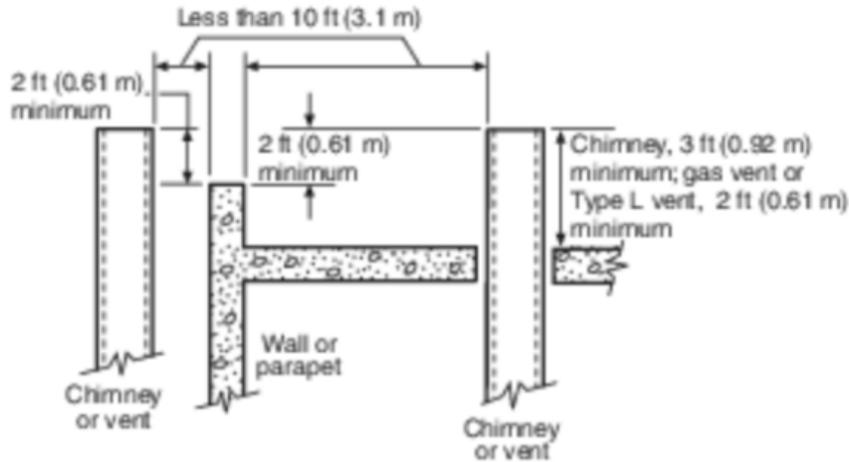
(a) Chimney or Vent Termination Less Than 10 ft (3.1 m) from Ridge, Wall, or Parapet.
